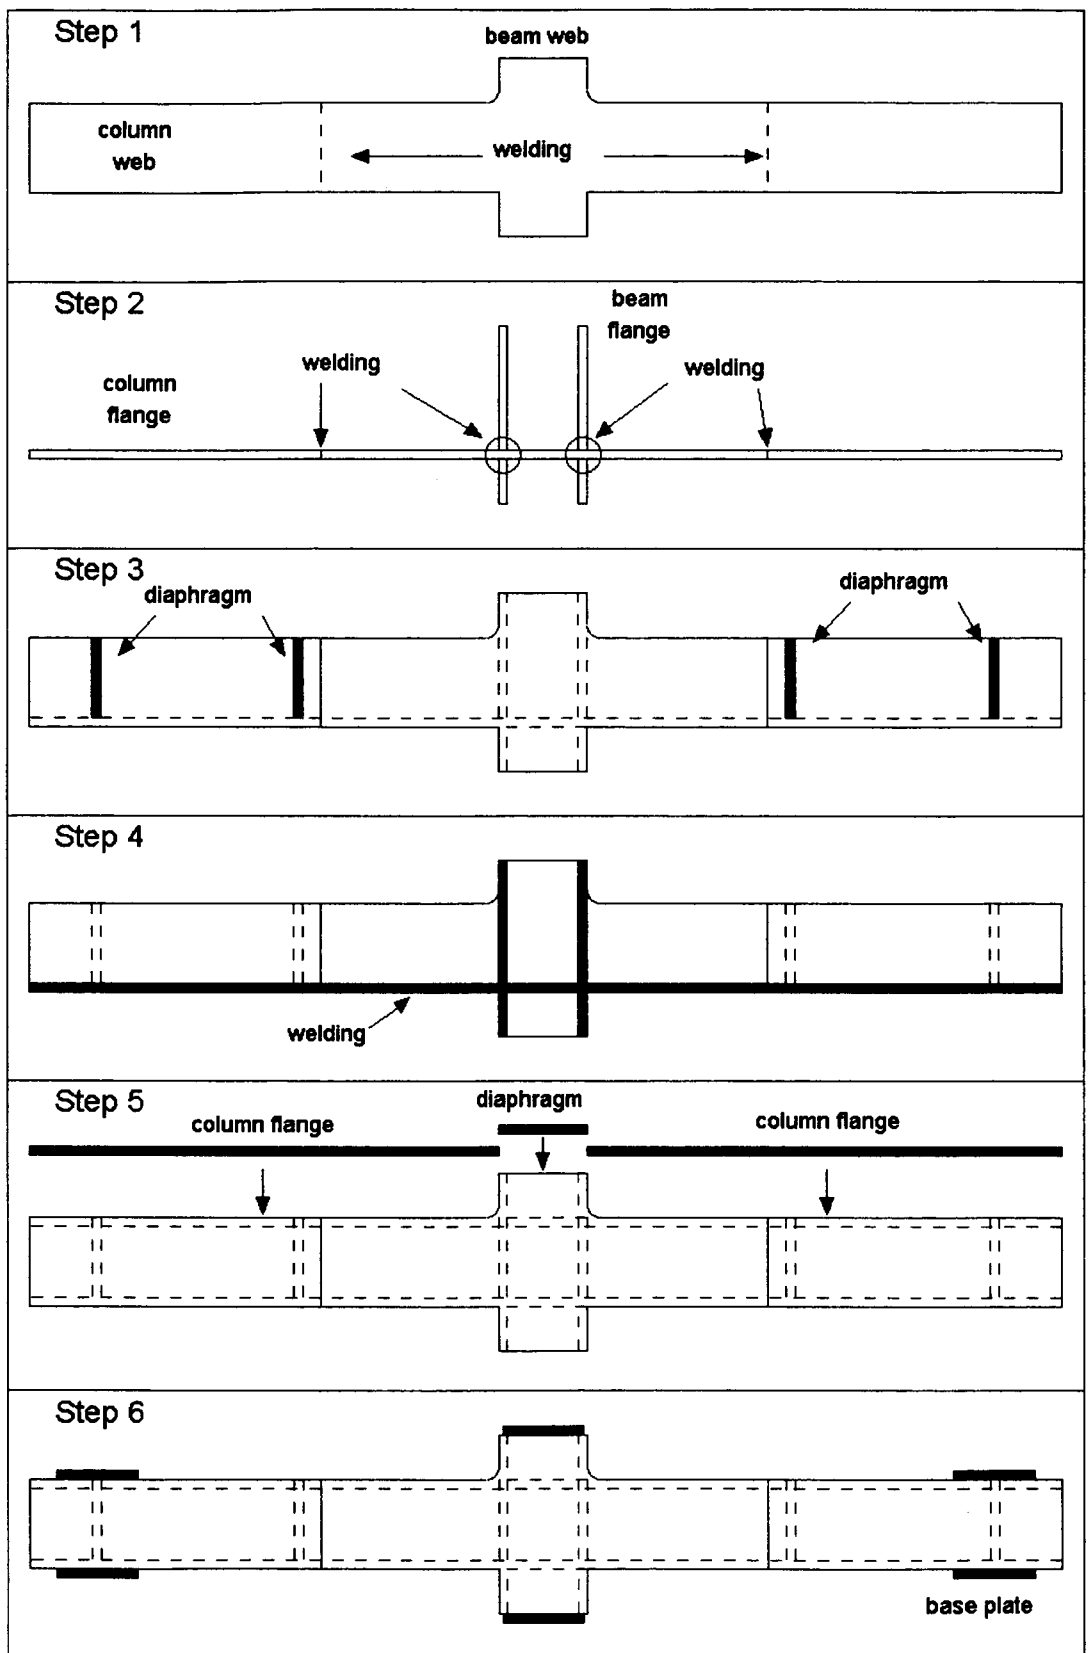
Procedure for manufacturing beam-to-column connected specimen.
